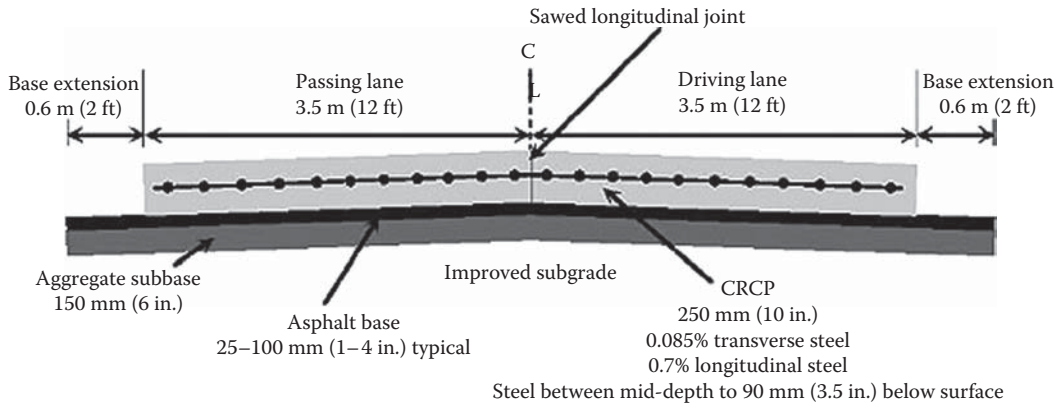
Typical CRCP cross-section. (From Rasmussen, R.O. et al., *Continuously Reinforced Concrete Pavement (CRCP) Design and Construction Guidelines*, Federal Highway Administration and Concrete Reinforcing Steel Institute, 2012.)
